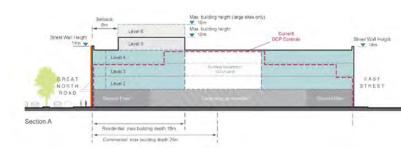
Section A: Great North Road to East Street (City of Canada Bay Council, 2013).
